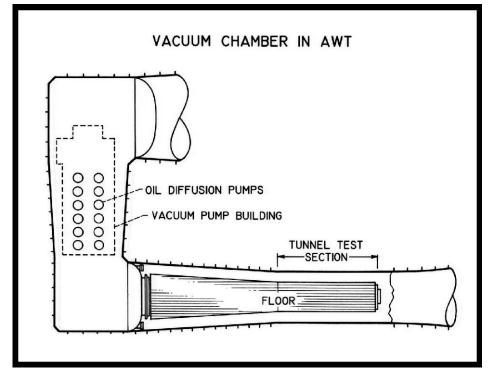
SPC No. 1, showing the Vacuum Pump House, bulkheads, and flooring in the former tunnel test section, 1961 (OH_Cuyahoga_Space-Power-Chambers_019).
